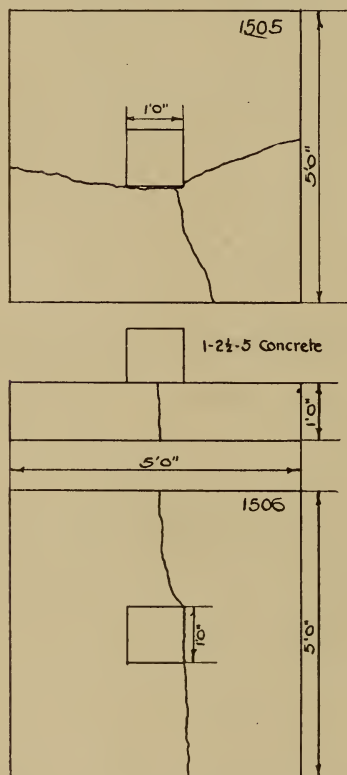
UNREINFORCED CONCRETE FOOTINGS—CRACKS AT FAILURE. (Talbot.)
